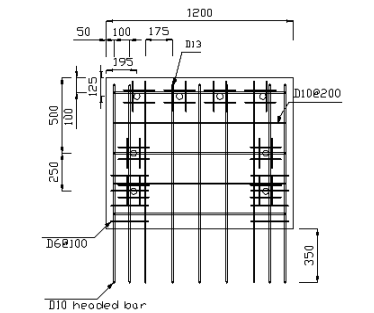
Details of externally-anchored precast wall-panel (EPCW)
